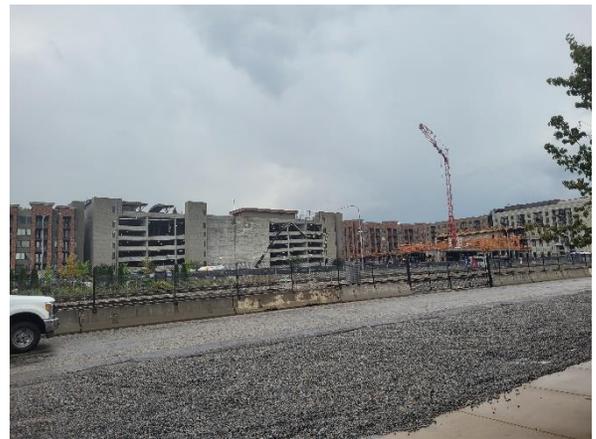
East-adjointing 500 West, railroad tracks, followed by parking garage and apartments.
